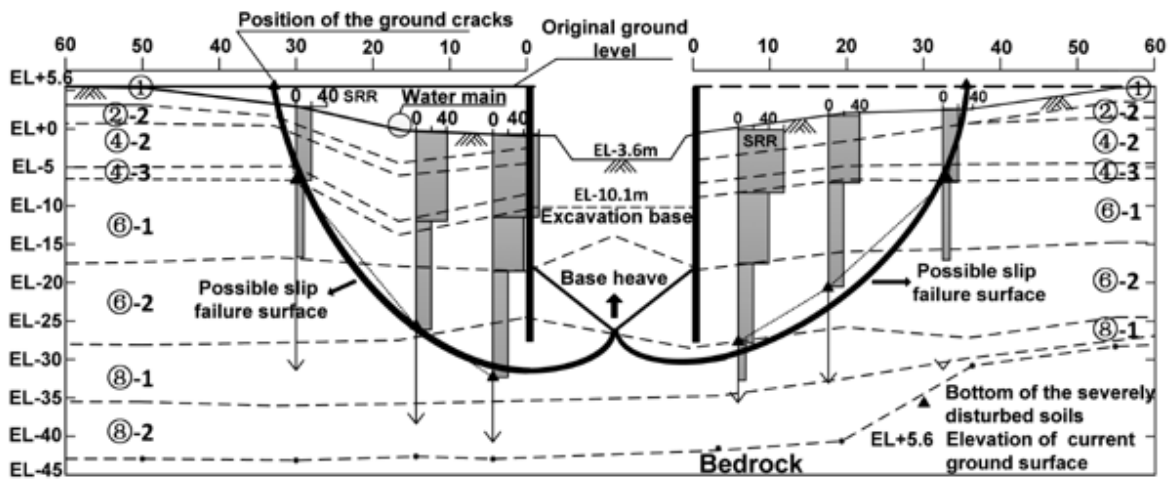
Example of basal-heave failure due to collapse at the N2 excavation of the Hangzhou, China subway collapse (Chen et al. 2013).
